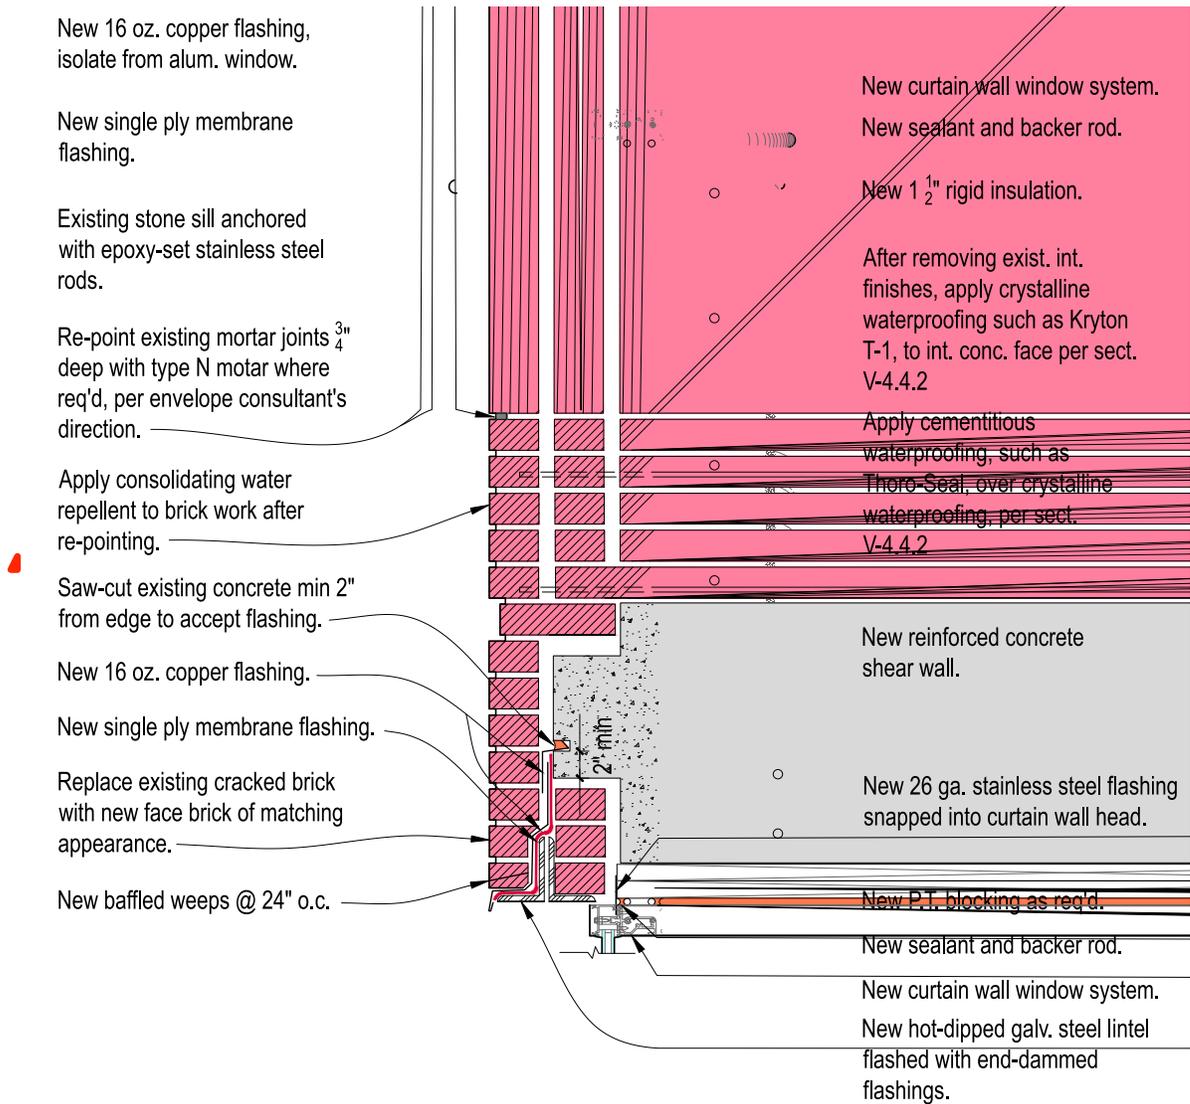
(1): Window-Head Lintel Replacement and Flashing
